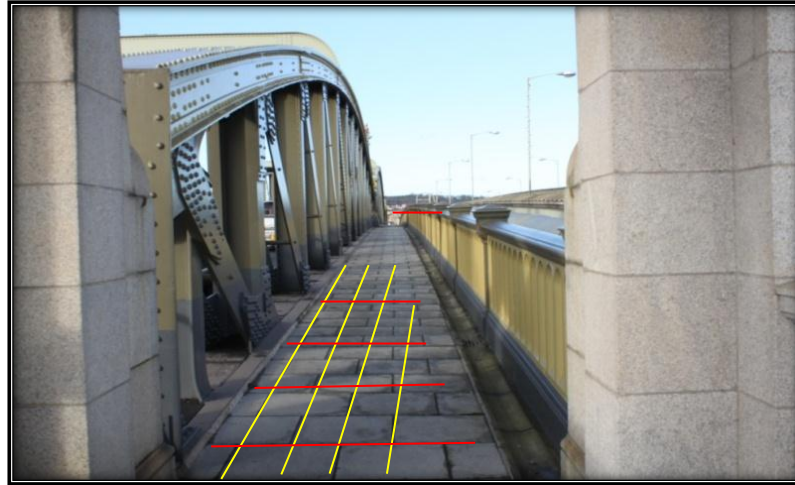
Bridge deck to be surveyed by GPR (north view) (photos from Gokhan Kilic, 2010)
